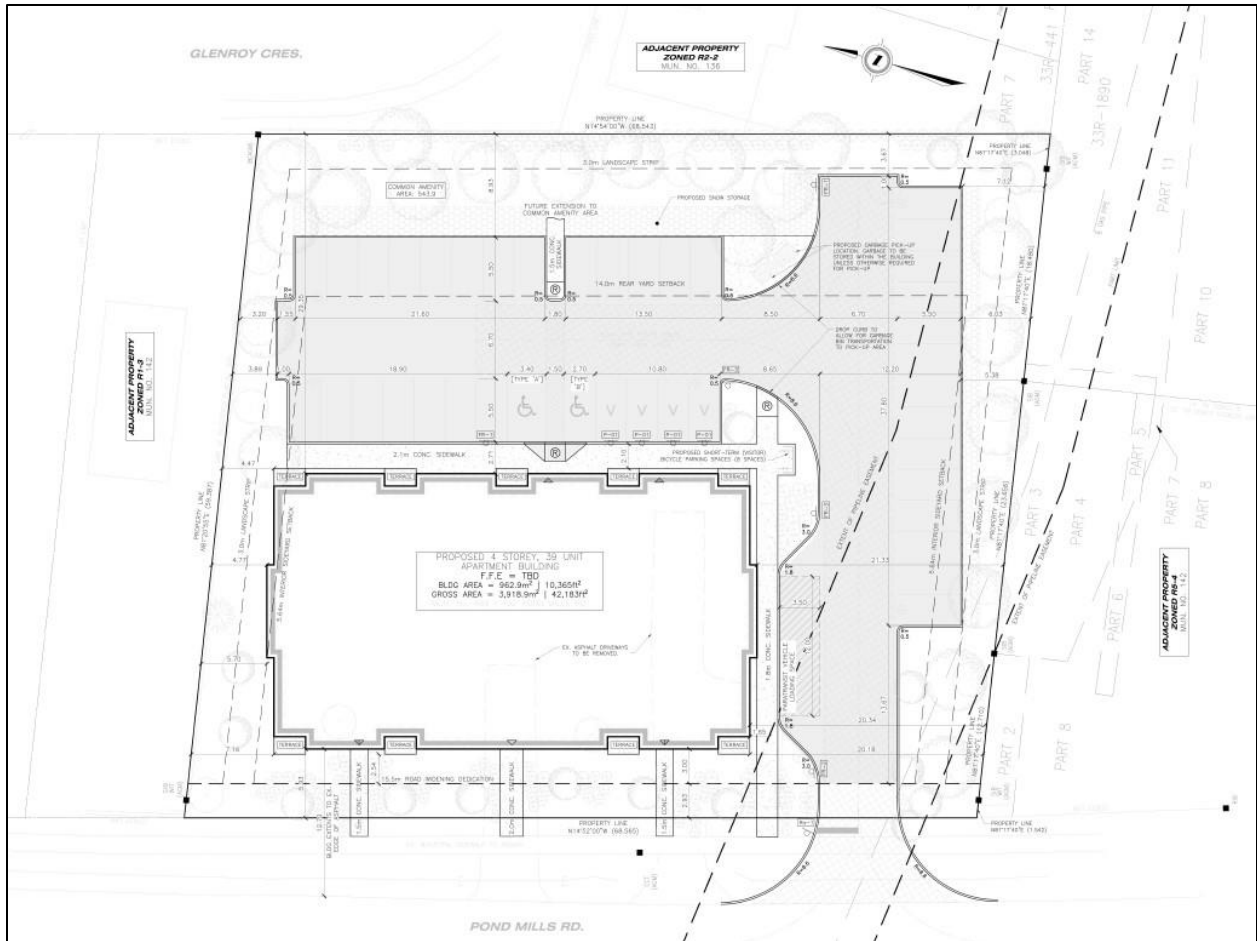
Revised Conceptual Site Plan (received October 2023)
